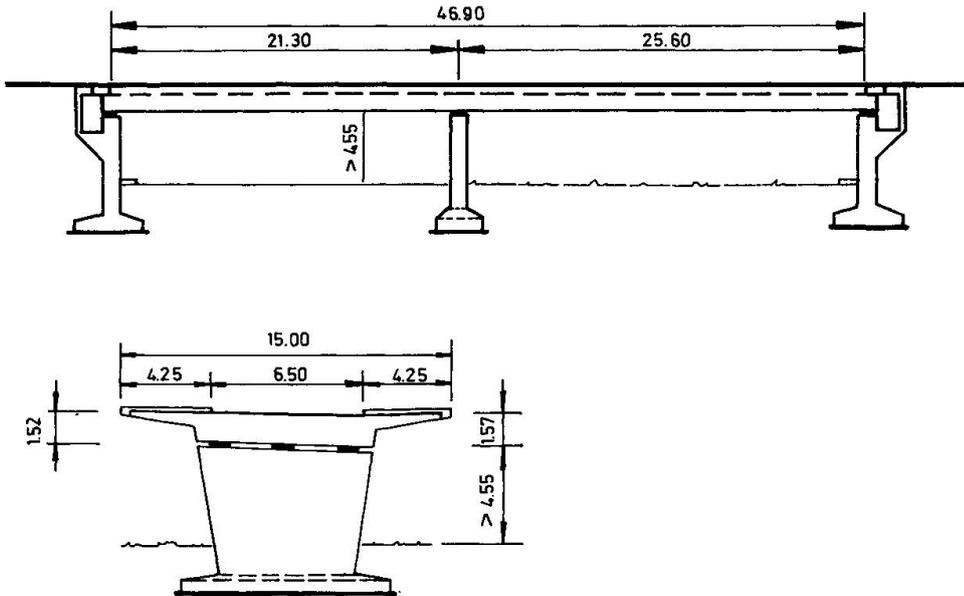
Longitudinal section and cross section of Bridge Ulenbergstrasse
